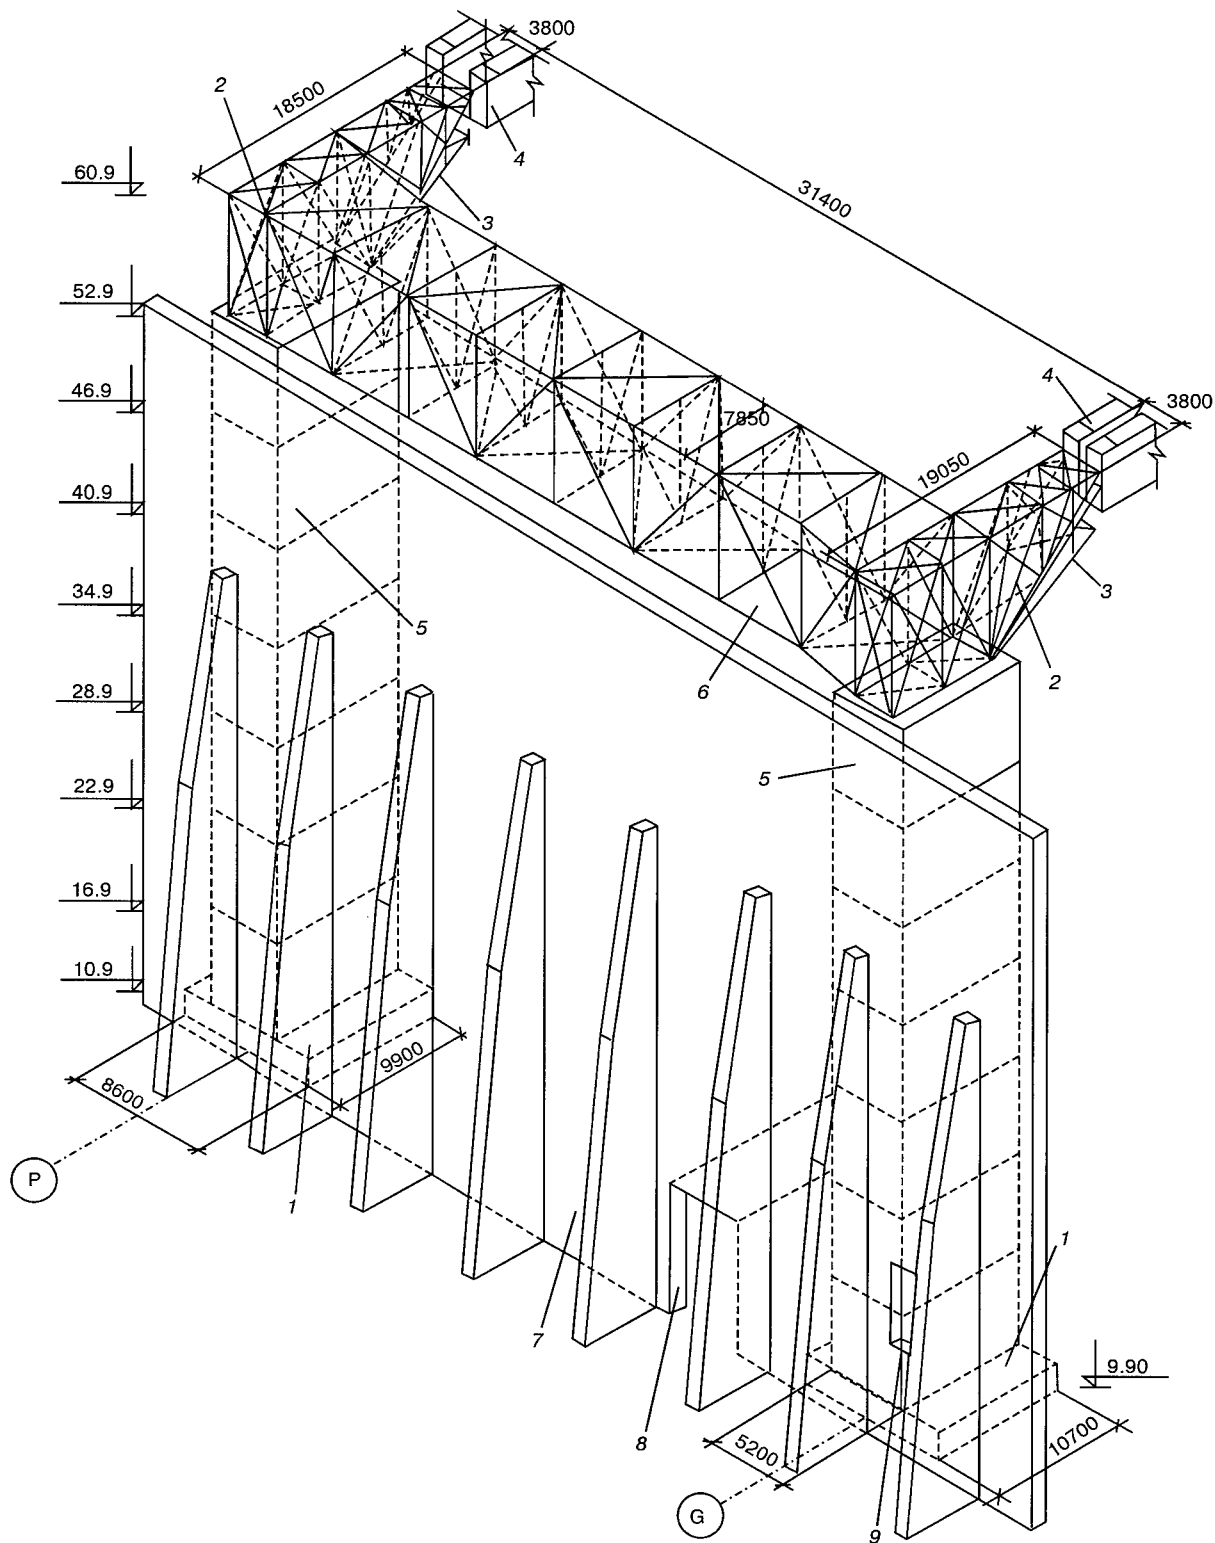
One of the variants of reinforcement of the western fragment of the Shelter (wall along axis 50): 1 – reinforced concrete bedplate; 2 – cantilever member; 3 – rest; 4 – block of beams B1 – B2; 5 – reinforced concrete column; 6 – spatial tie member; 7 – counterfort wall; 8 – transport corridor; 9 – opening
